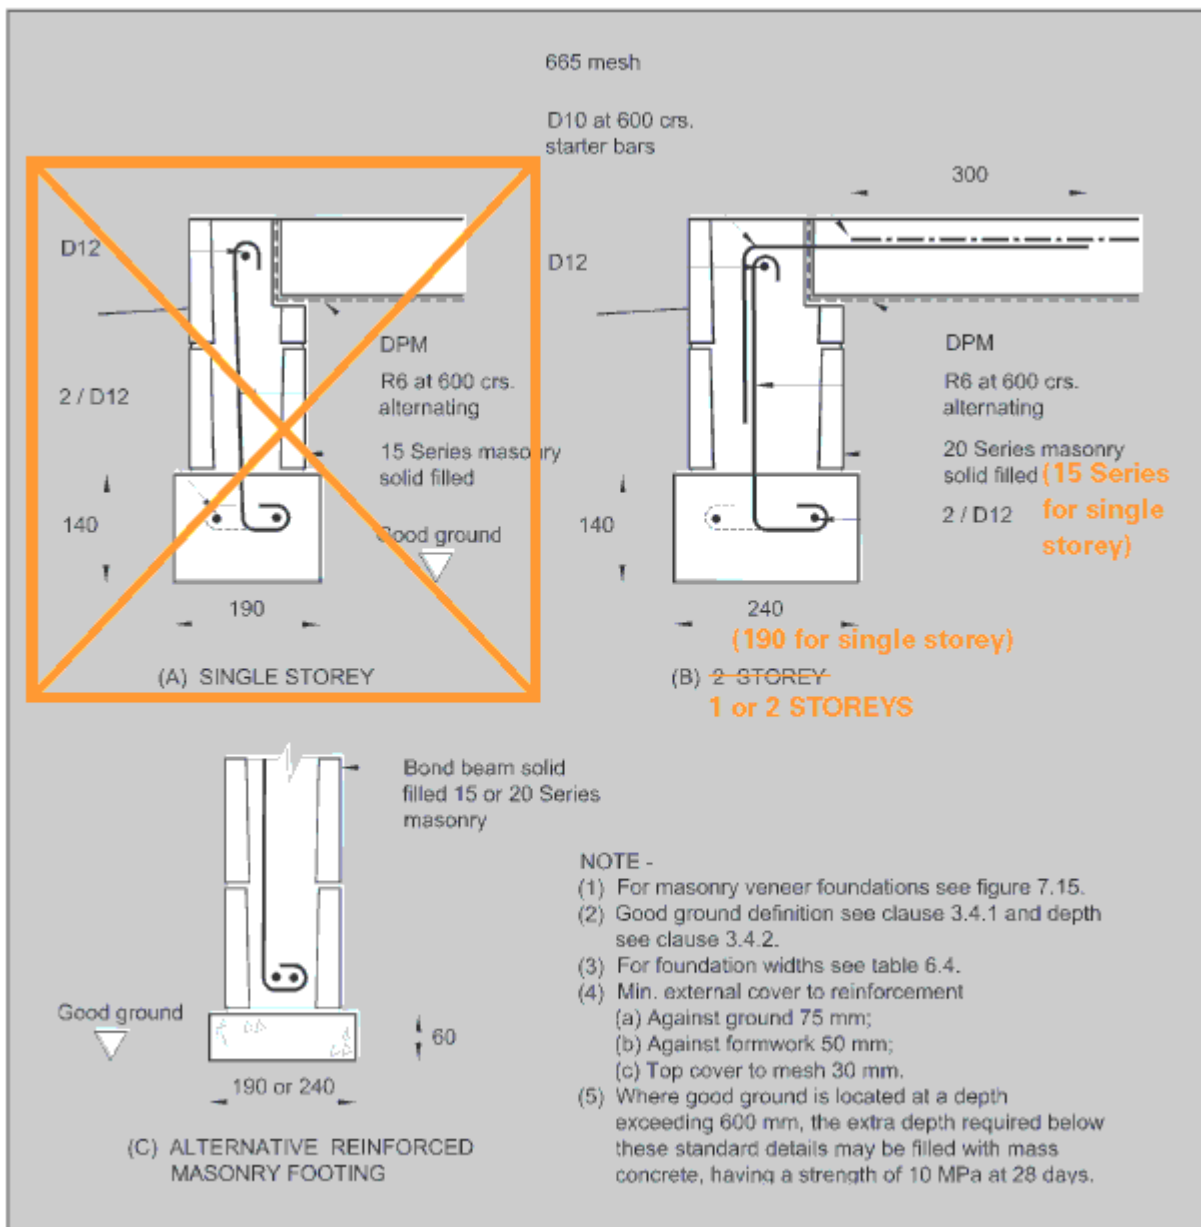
Foundation edge details - Concrete masonry (see 7.5.2.3)
